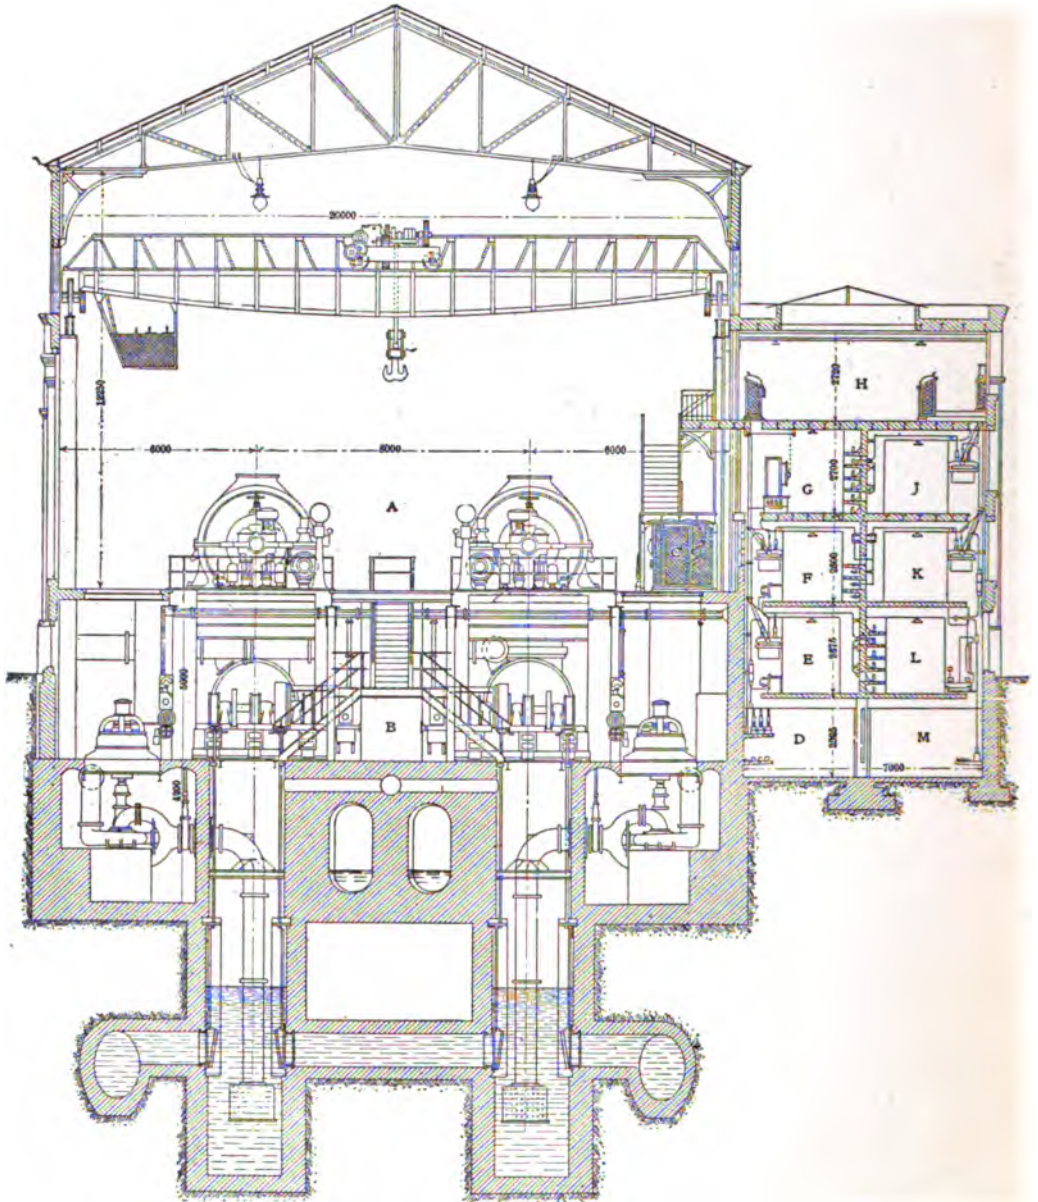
Cross-Section, St. Denis Plant, Paris.
